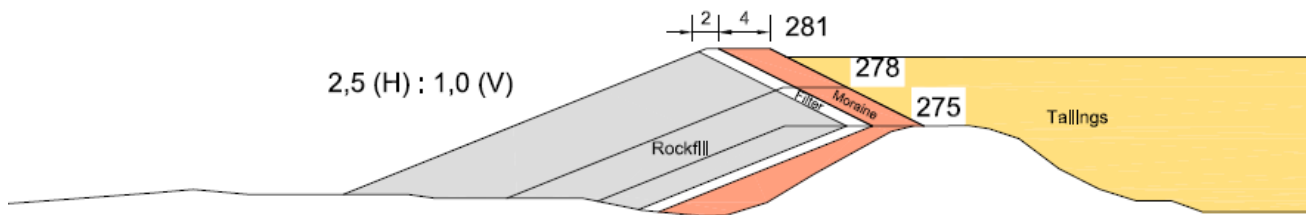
TSF NAG West Dam typical cross section (at existing Southwest dam location)
